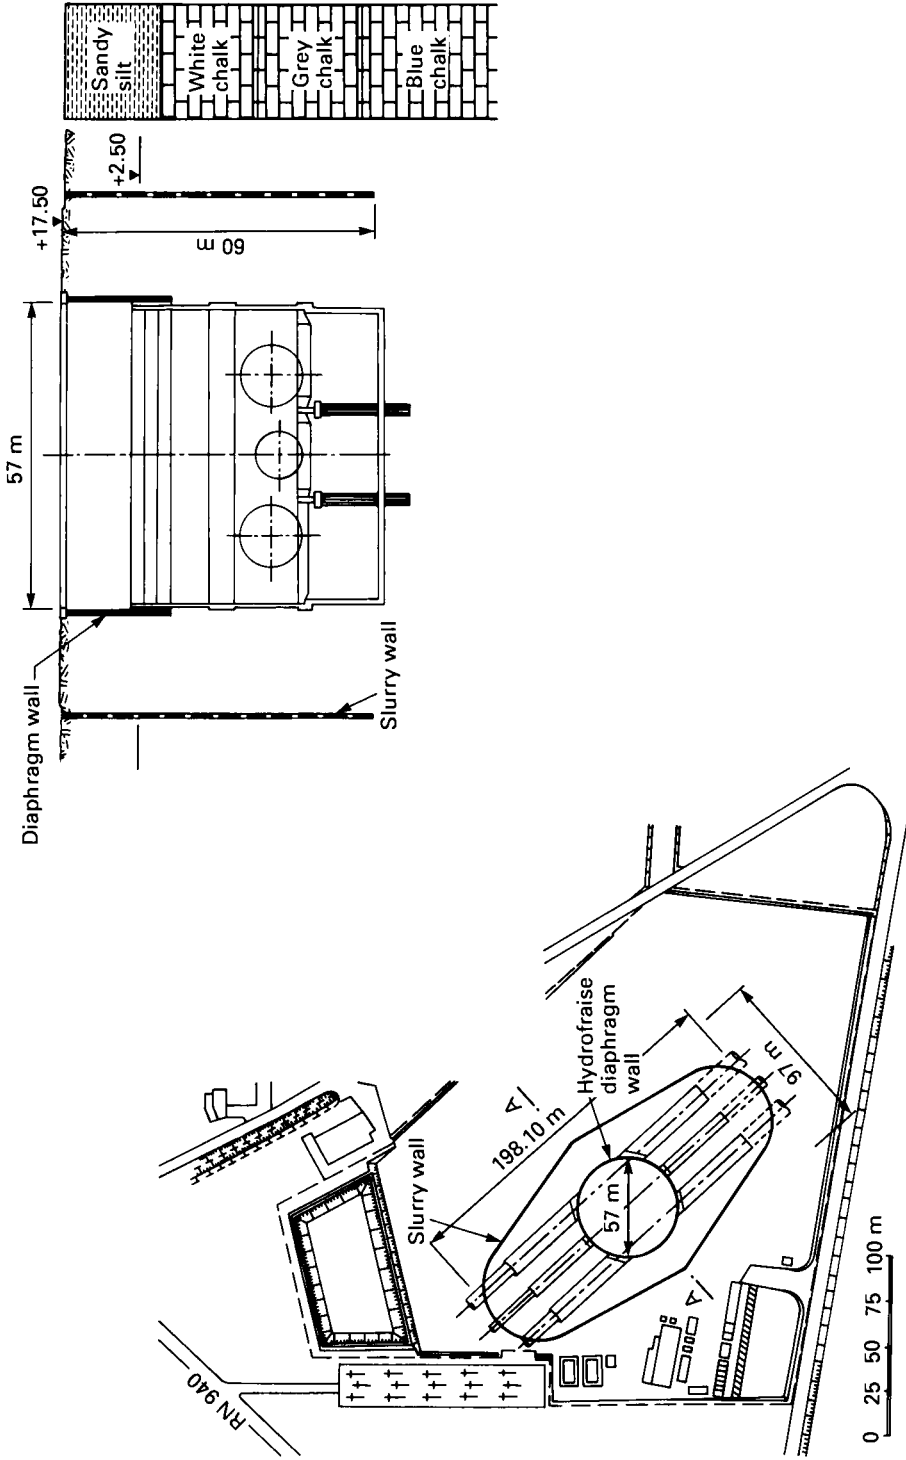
Layout of diaphragm walls at the Sangatte Channel Tunnel access shaft
